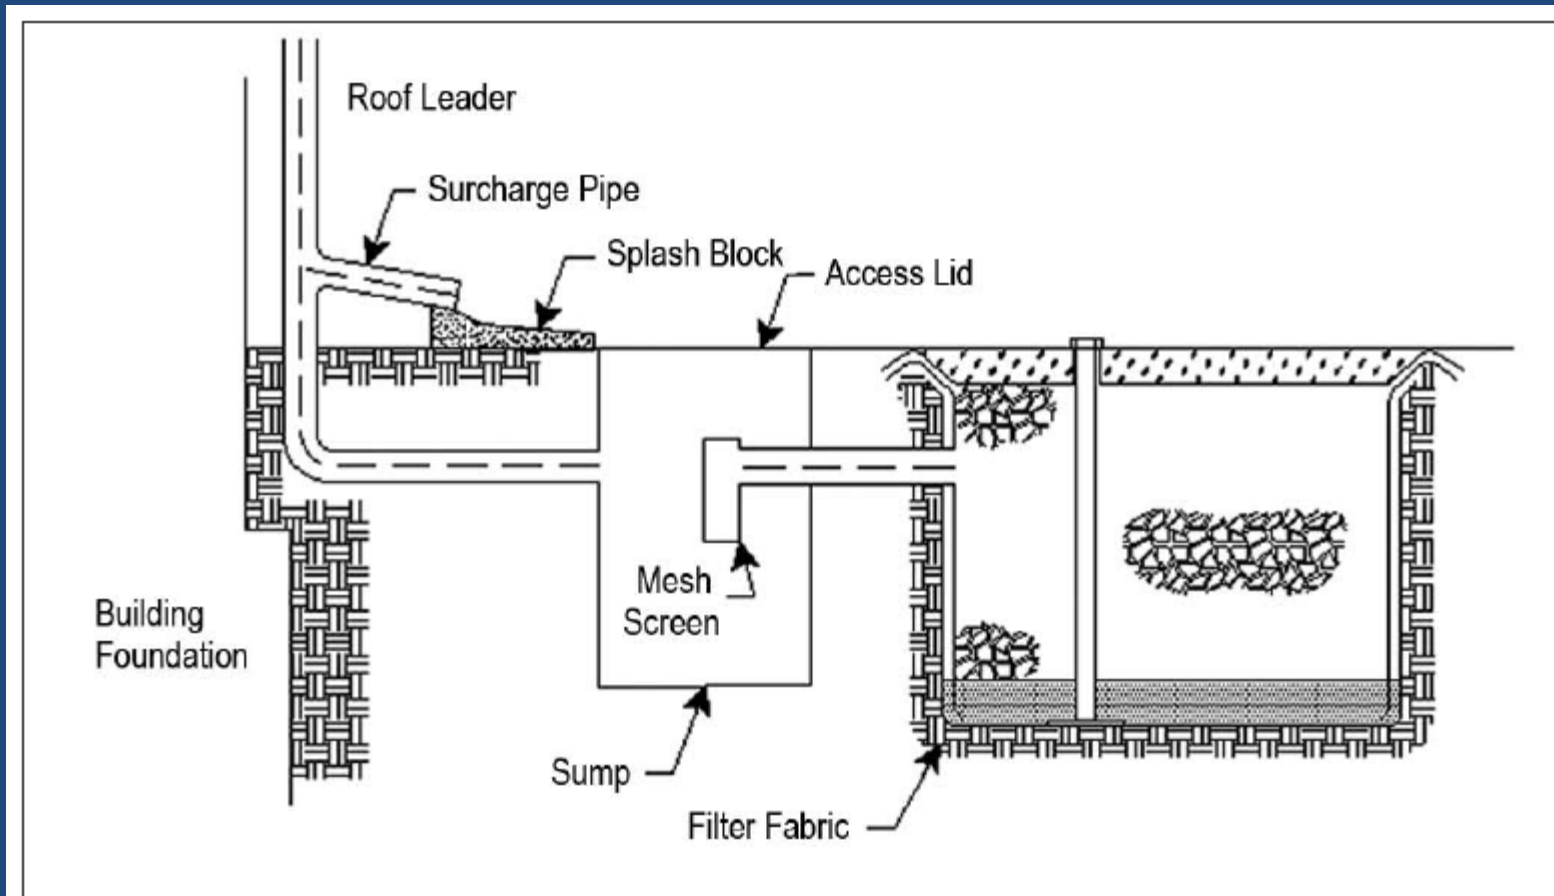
Underground pretreatment facility and infiltration trench for treating rooftop runoff.
